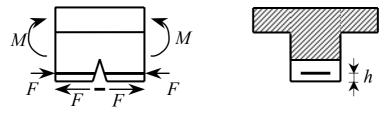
Cracked T cross-section of a reinforced concrete beam under bending moment M.
